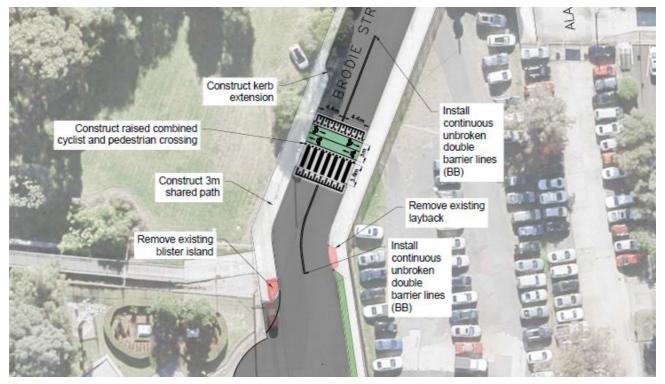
Concept plan of the proposed raised combined pedestrian and cyclist crossing in Brodie Street south of Alan Street, Rydalmere
